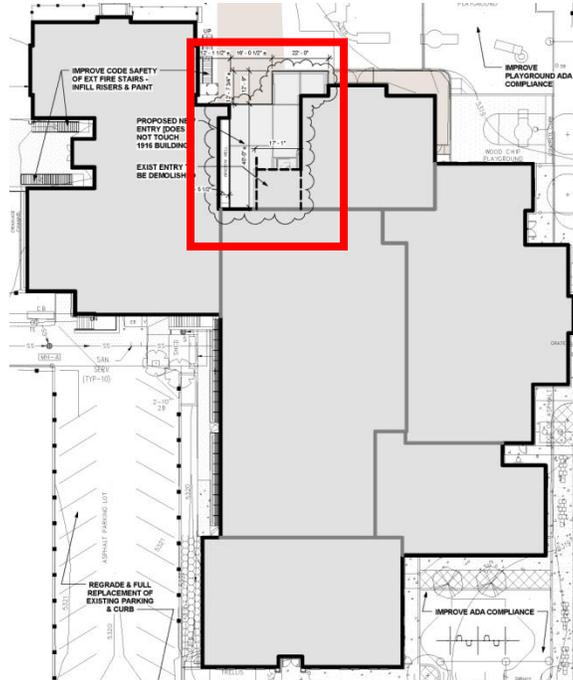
Site Plan. Location of north entry proposal outlined in red.
